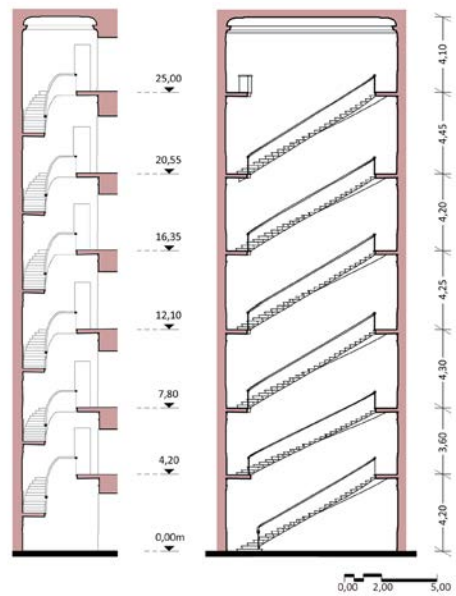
Helicoidal staircase of Palazzo Mannajuolo. Longitudinal section and cross section.
